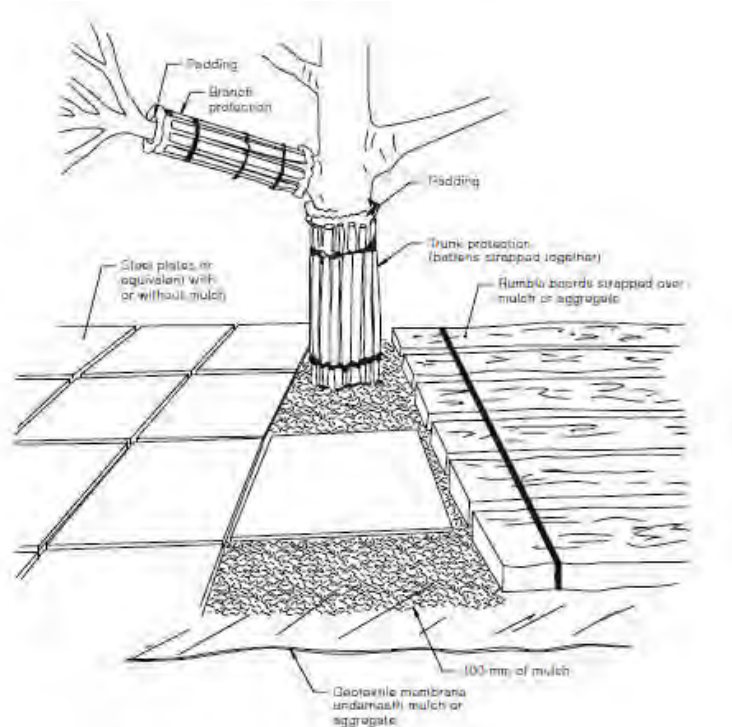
Example of trunk, branch and ground protection (Source: AS 4970-2009).
